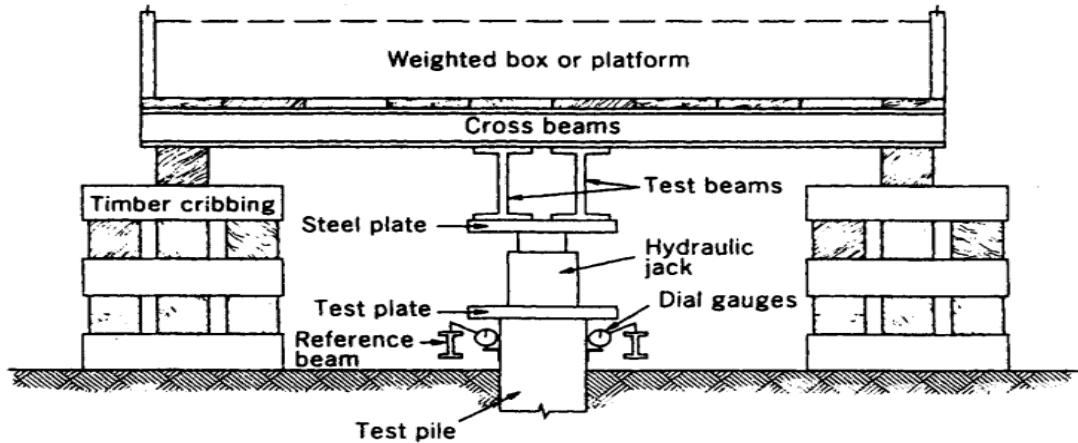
Typical setup for Pile Load Test in compression using Timber Cribbing and the weighted box (ASTM, 1986)
